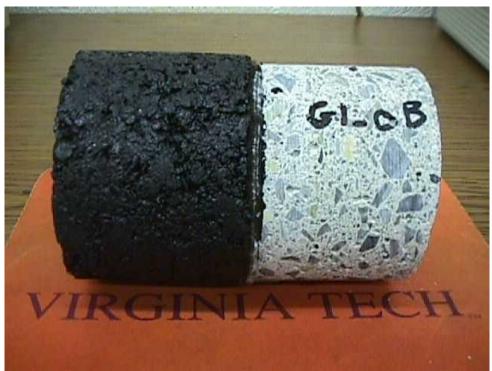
Typical Simulated Bridge Deck Specimen before Failure.
